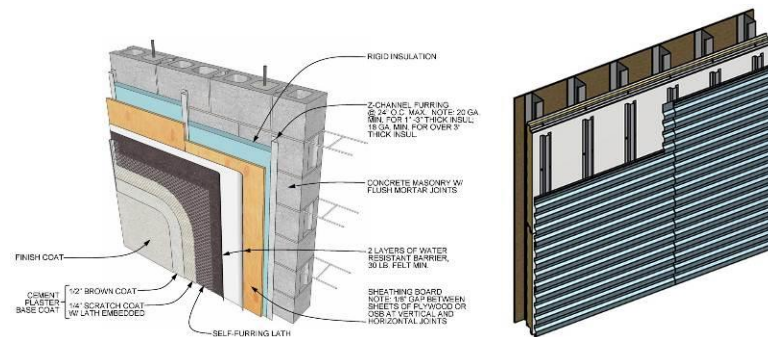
Comparison of different types of wall details: old structural system with masonry block walls on the left and new structural system with sandwich walls on the right
